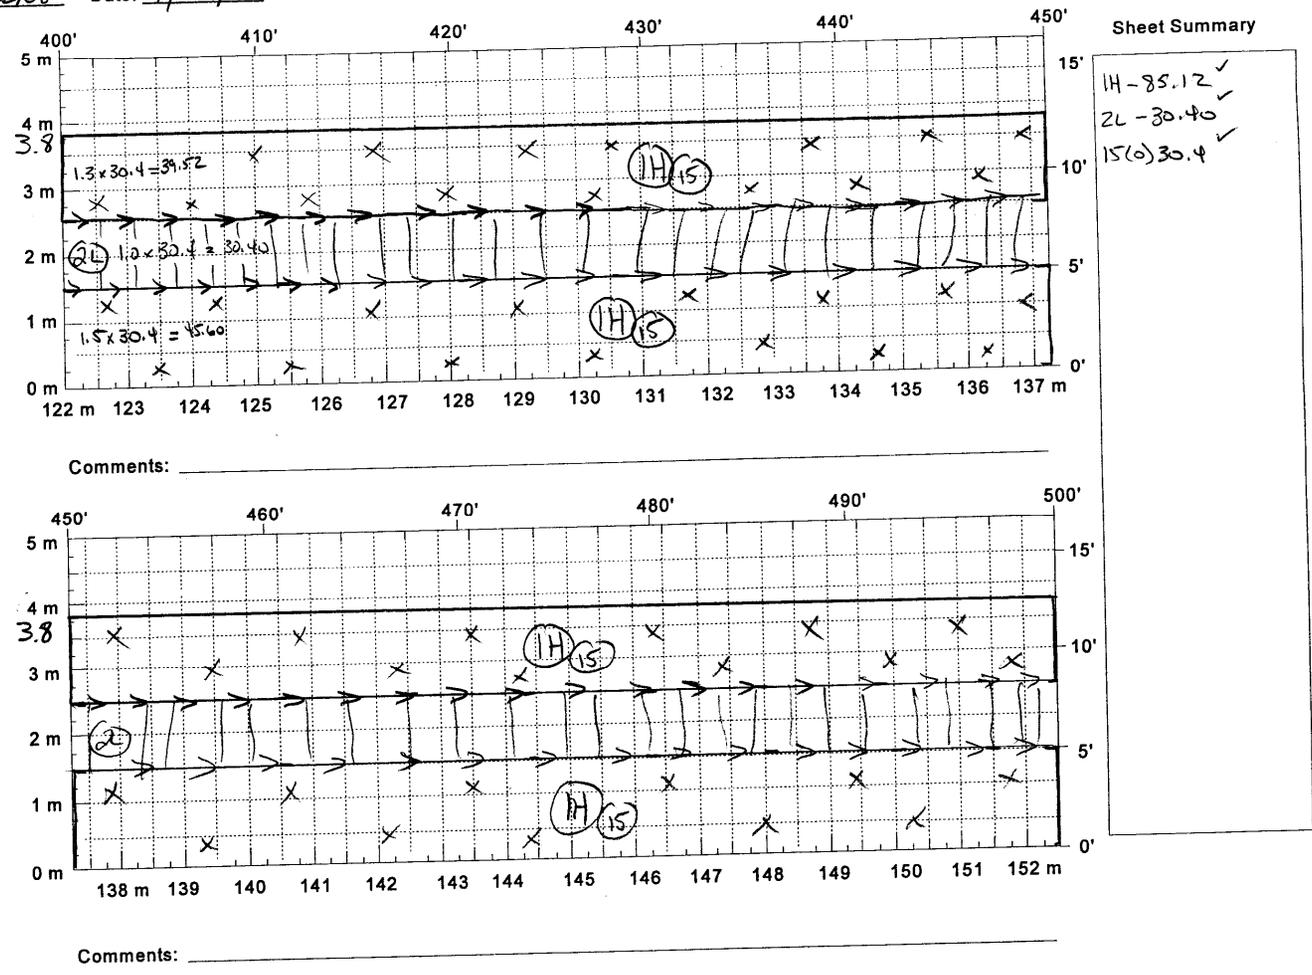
Pavement Distress Map; Station 4+00 to 5+00; Section 0505.
